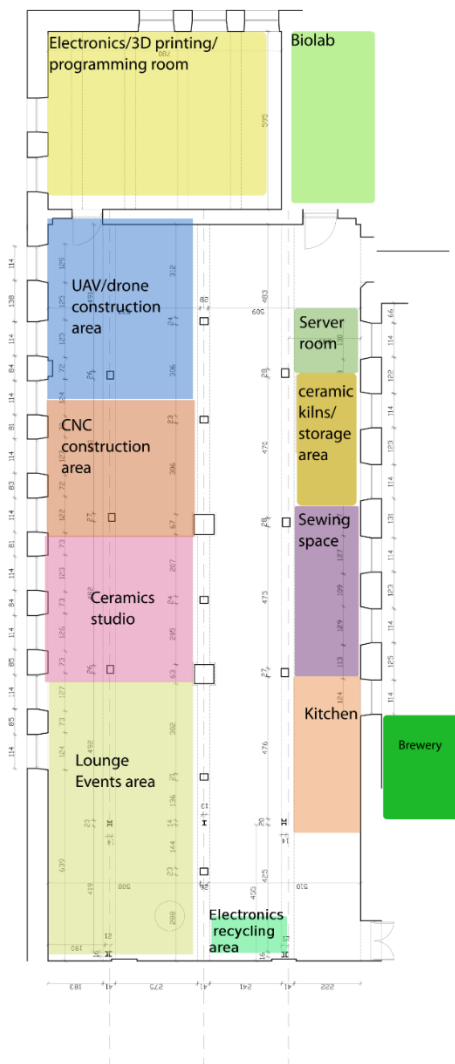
Architectural plan of the shared space in Technarium (first floor). (Ground floor where metalworks and woodworks are located are not shown.) The plans serves to demonstrate the overlapping, and walk through nature of the different areas. The only areas separated by a wall from the rest are brewery, biolab and electronics/3D printing/programming room. Source: Technarium archives.
